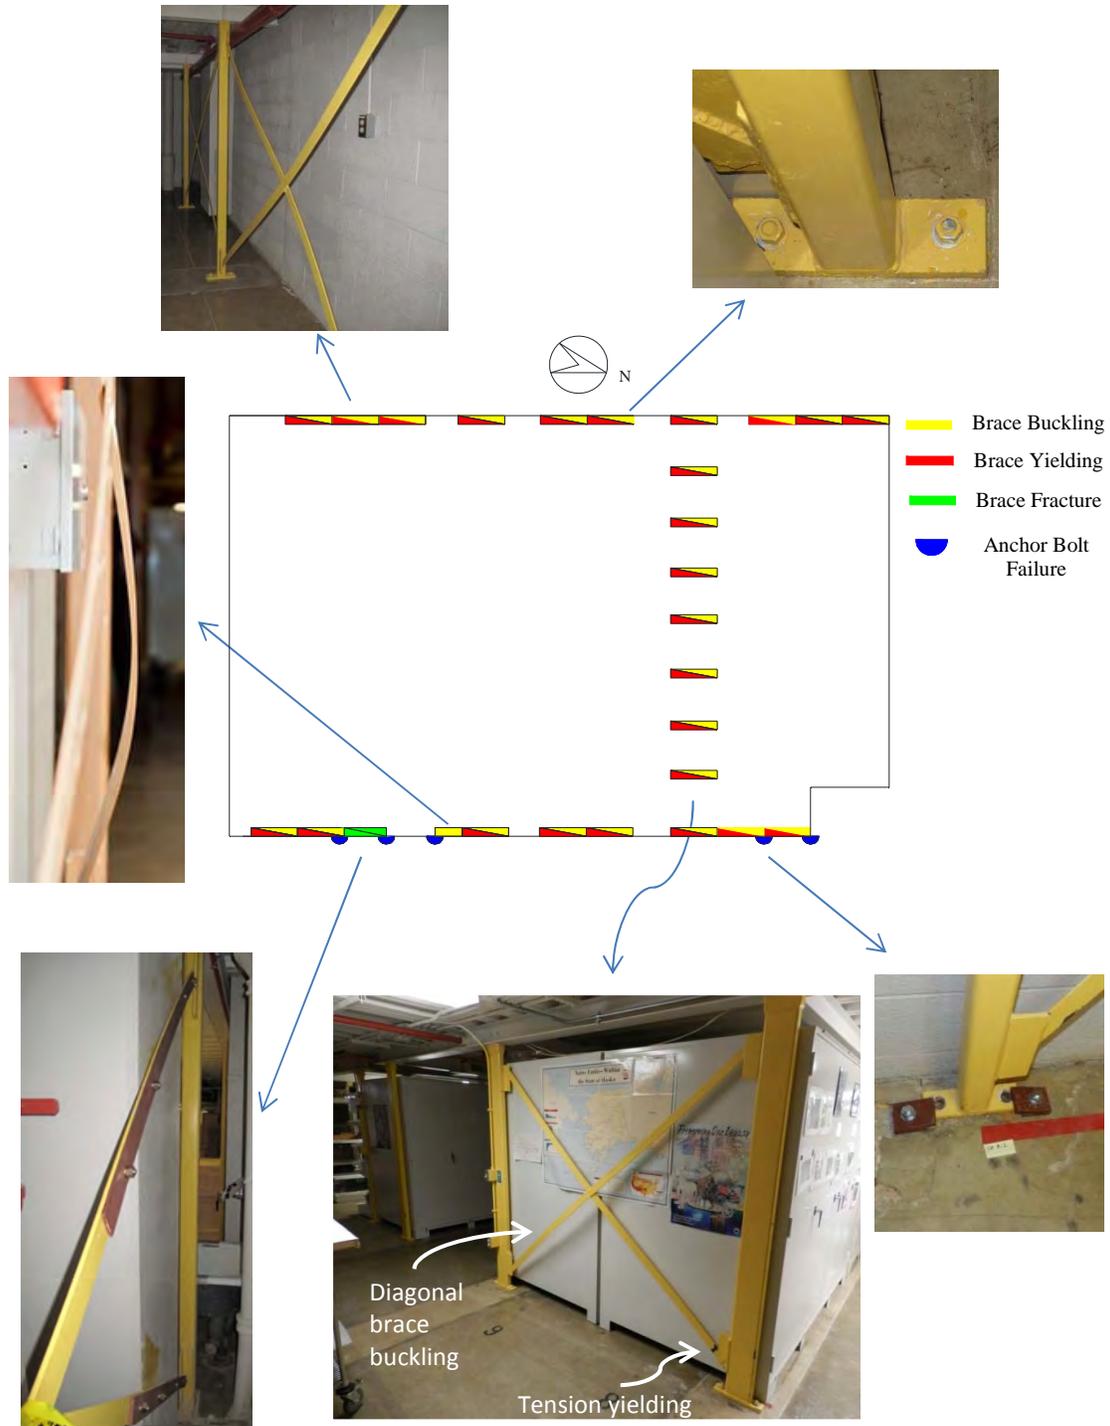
Type and distribution of damage in the first story of steel mezzanine in Pod 1
